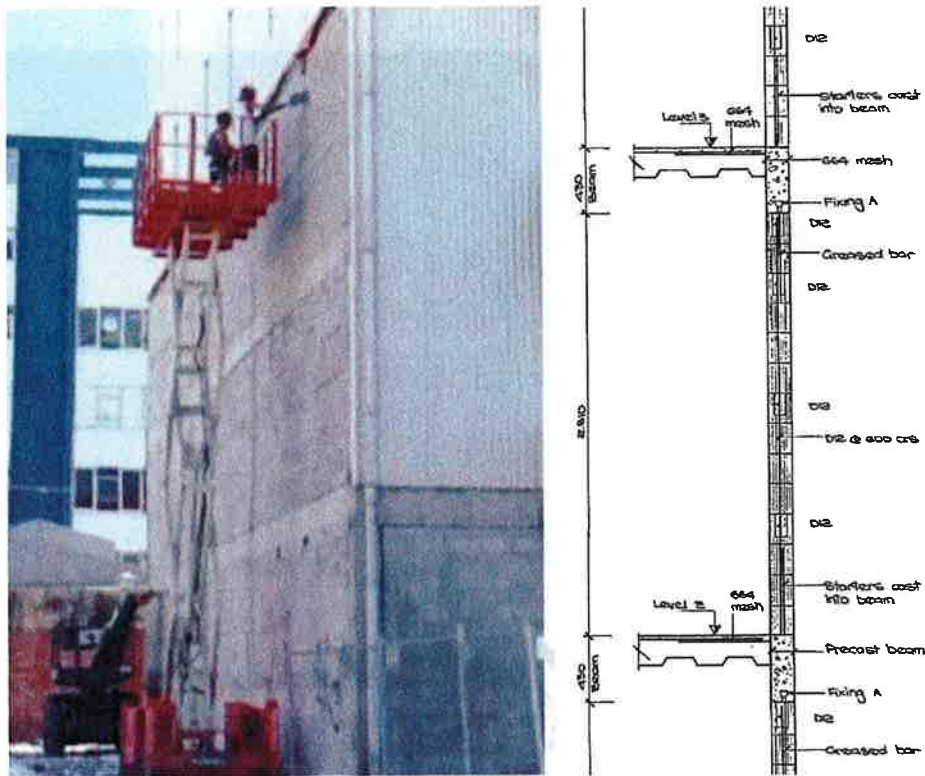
West wall on Line A (left to right) : Being prepared for strapping and cladding a day or so before collapse on 22nd February; b) Connection of west wall block work into floor beams top and bottom (portion of DENG Dwg S9 Section 6), showing the fixing of the top of the wall into the structure.
